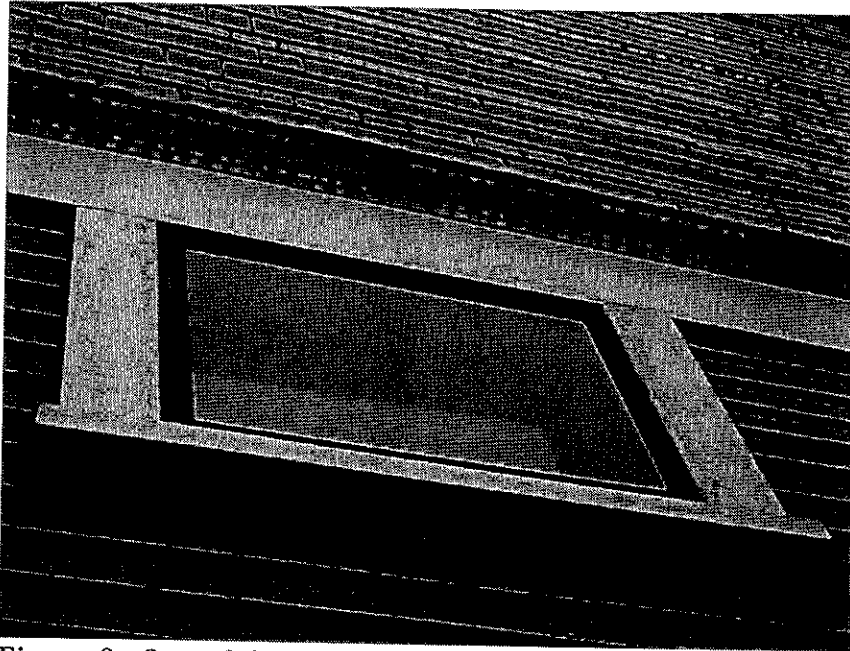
Typical original 1-over-1 true-divided-light double hung windows. Windows to be sympathetically replaced on the north, south, and west elevations.
